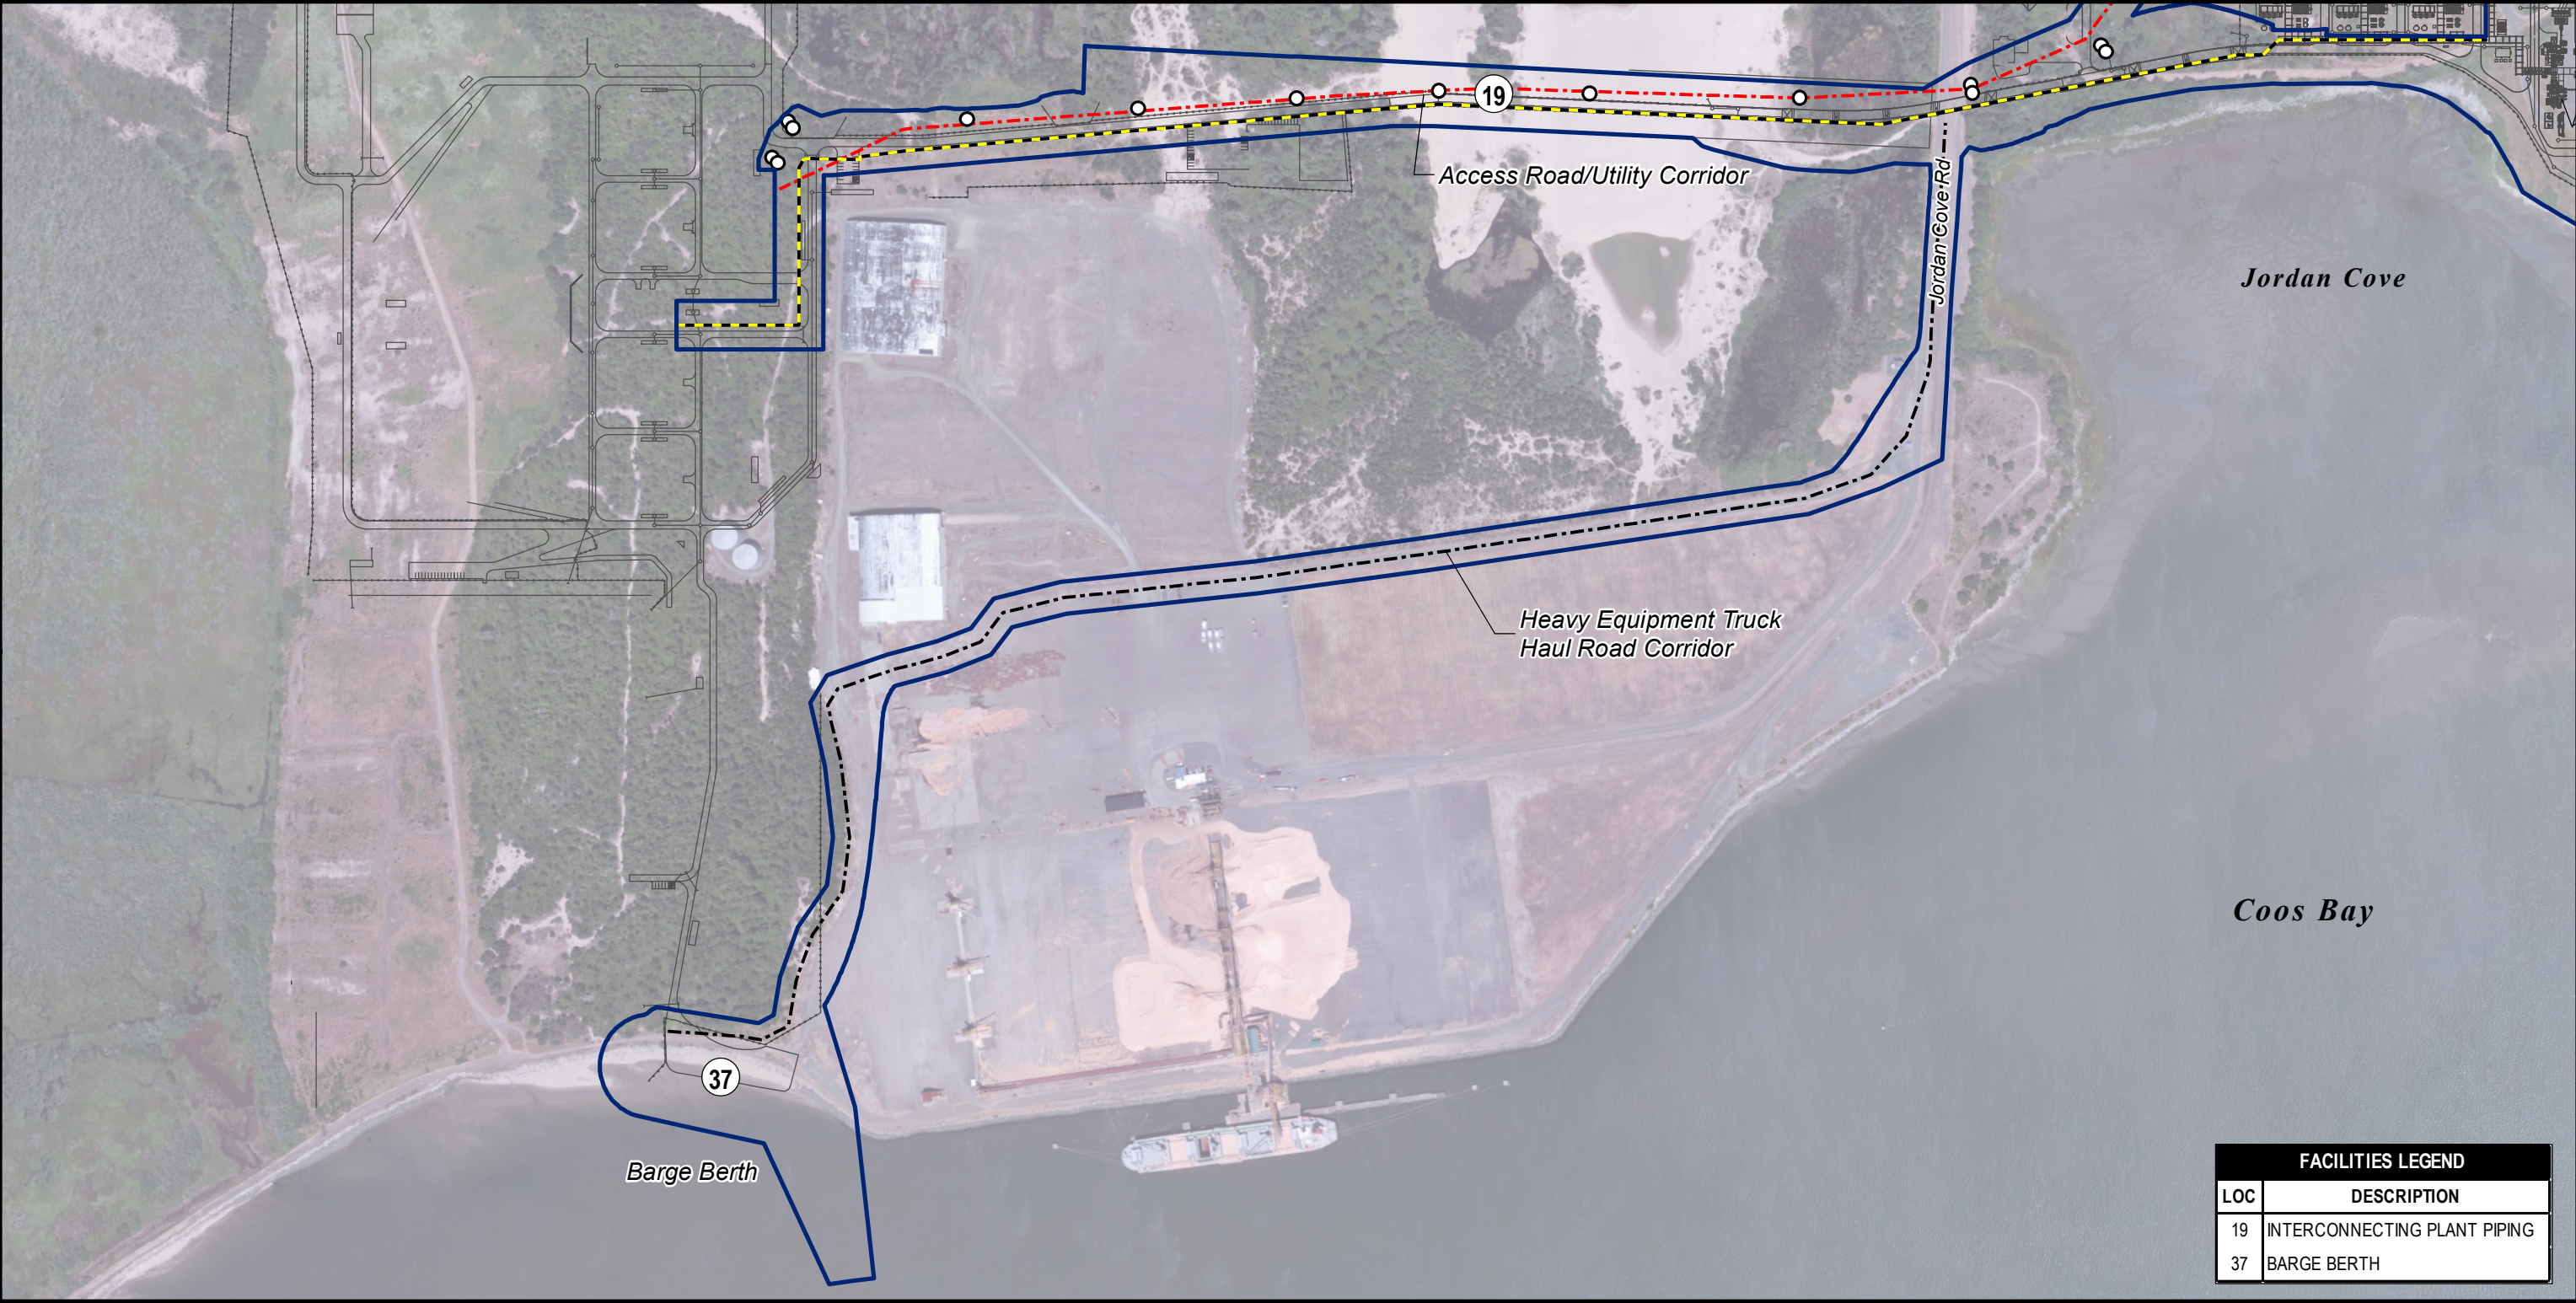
Sheet 2. Facility Layout with Related or Supporting Facilities
